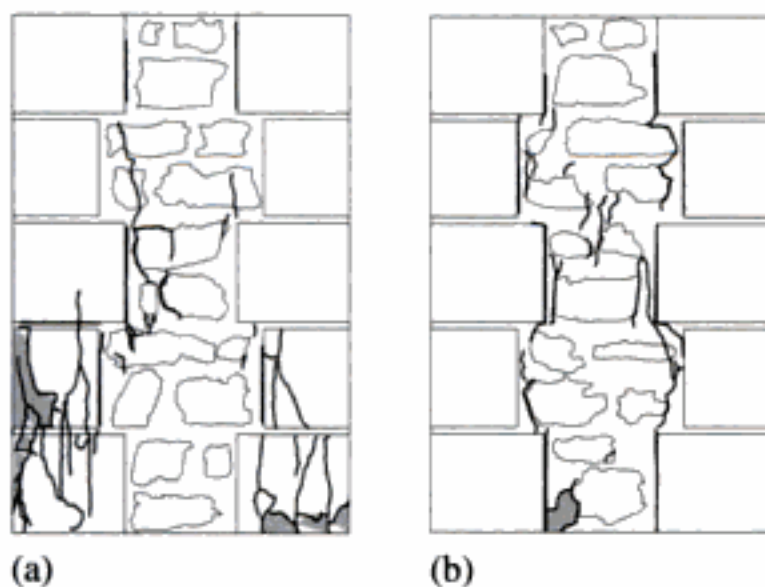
Ultimate failure patterns for the wallets with keyed collar joints: (a) Noto (NO3) and (b) Serena (SO3).
